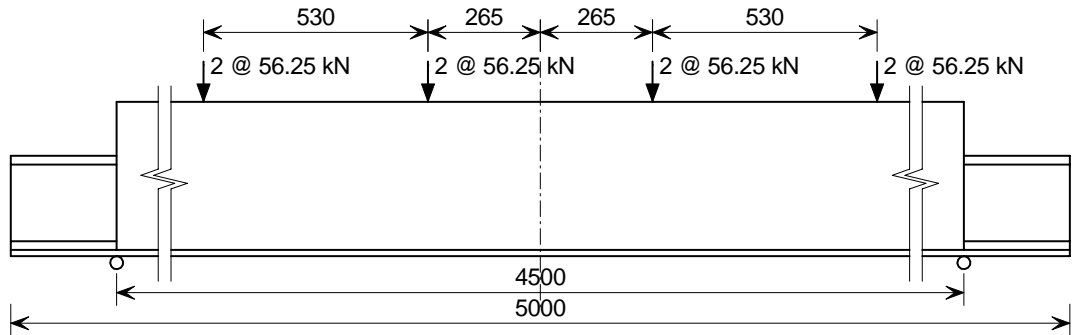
Longitudinal arrangement of hydraulic loading rams
